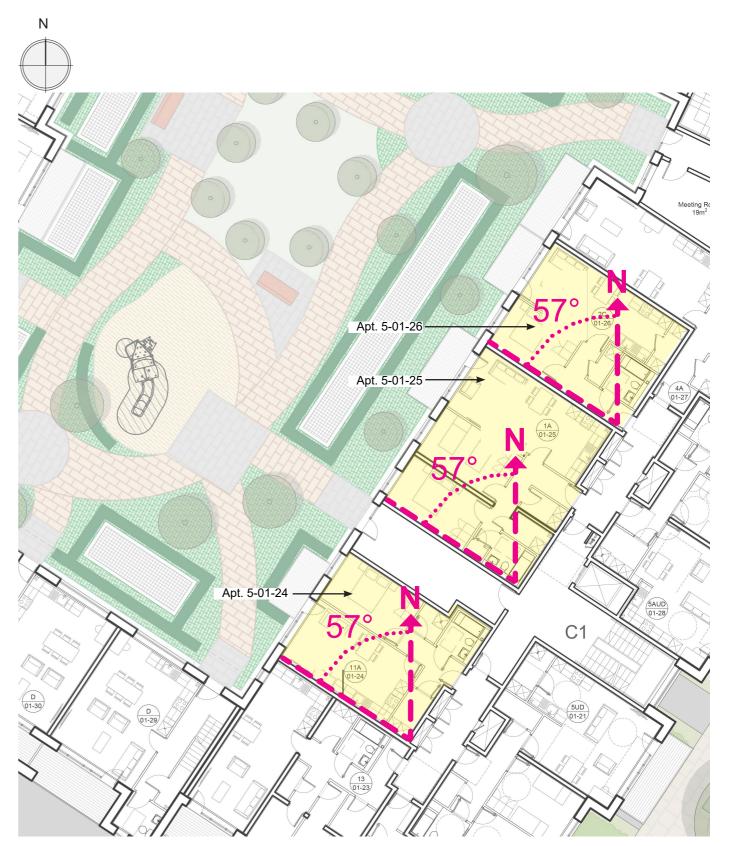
Block 5 First Floor Plan With Units 01-24, 01-25 and 01-26 highlighted
